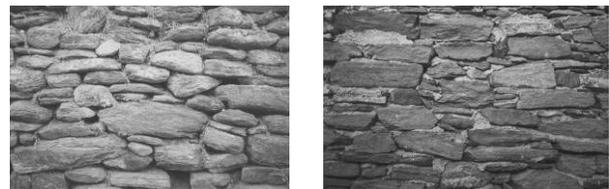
Stone wall construction in Sifnos (a) with local stone and earth mortar and (b) with slate and cement mortar.
